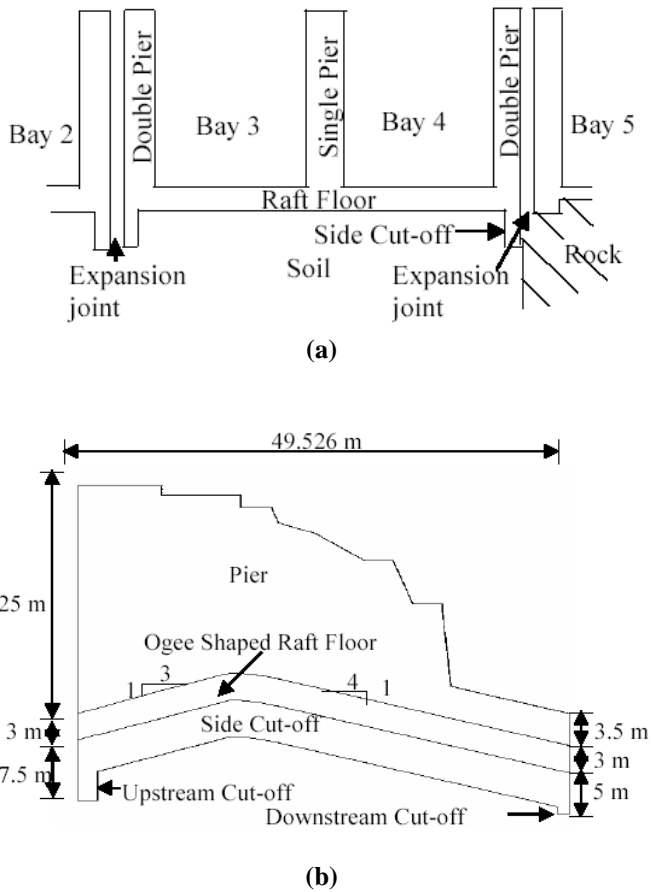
(a) Transverse section of barrage bays 3-4 and (b) longitudinal section of the barrage bay.
